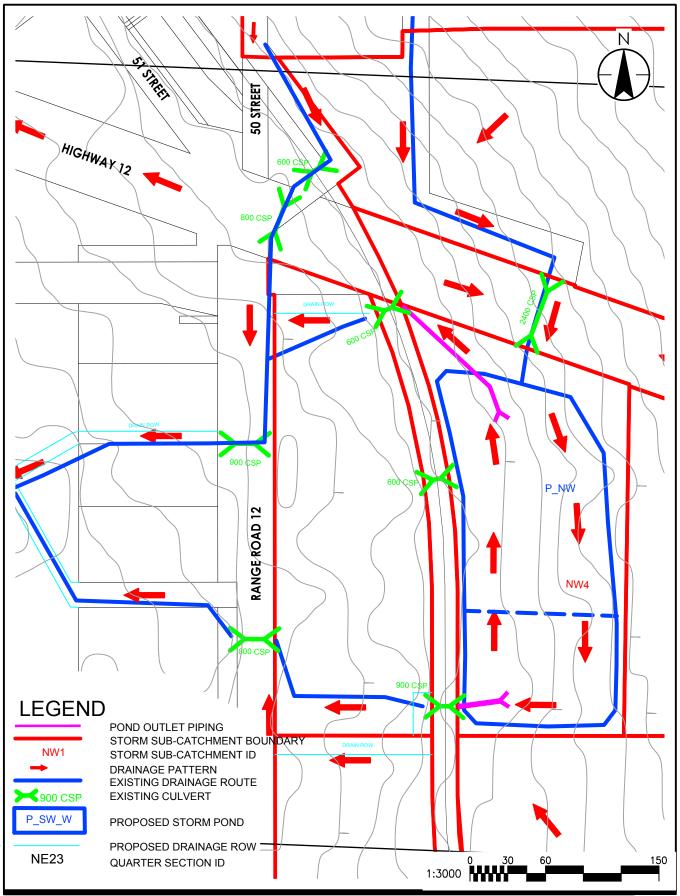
NW STORM POND BENTLEY SE ASP STORMWATER SERVICING STUDY
